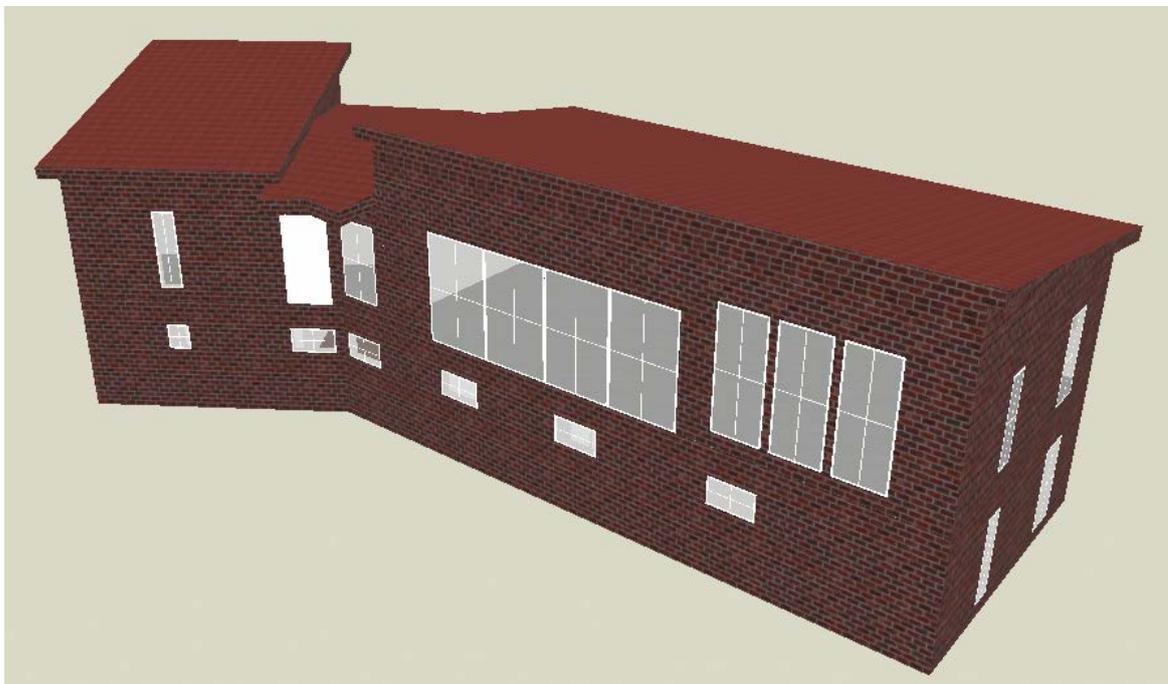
Building façade of the Passive House applied the Conventional House building materials.
